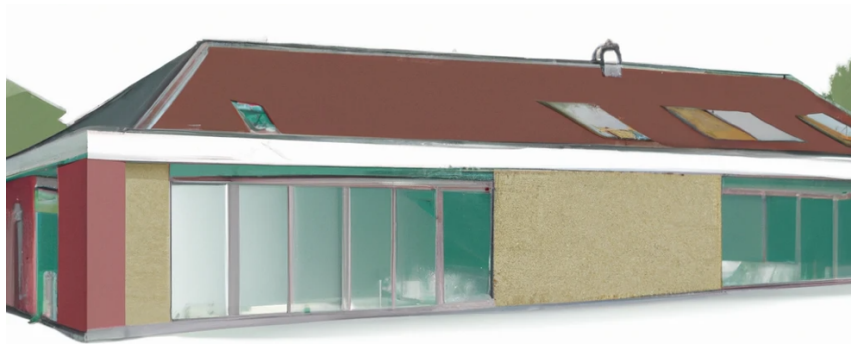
Sketchup model of typical Belgian residential building. (A.I generated image)
